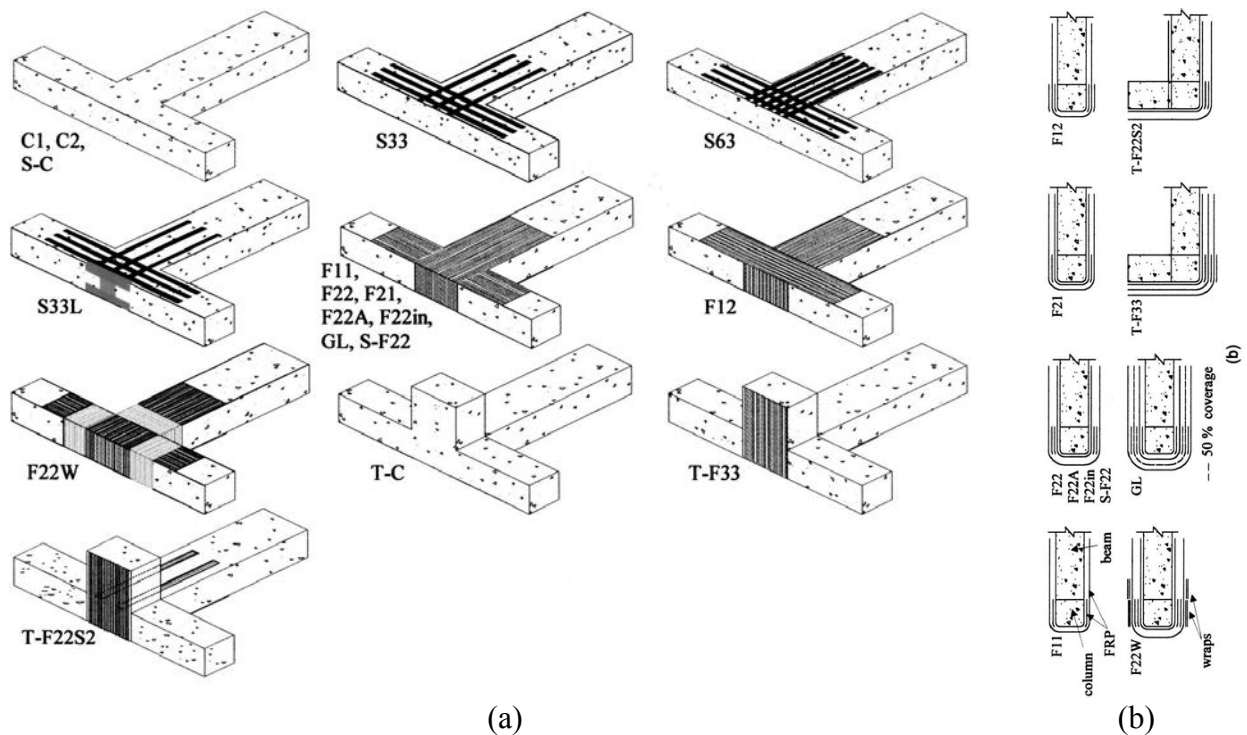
Proposed strengthening scheme by Antonopoulos and Triantafillou (2003) : (a) Description of specimens and strengthening alternatives; (b) Layout of FRP layers.
